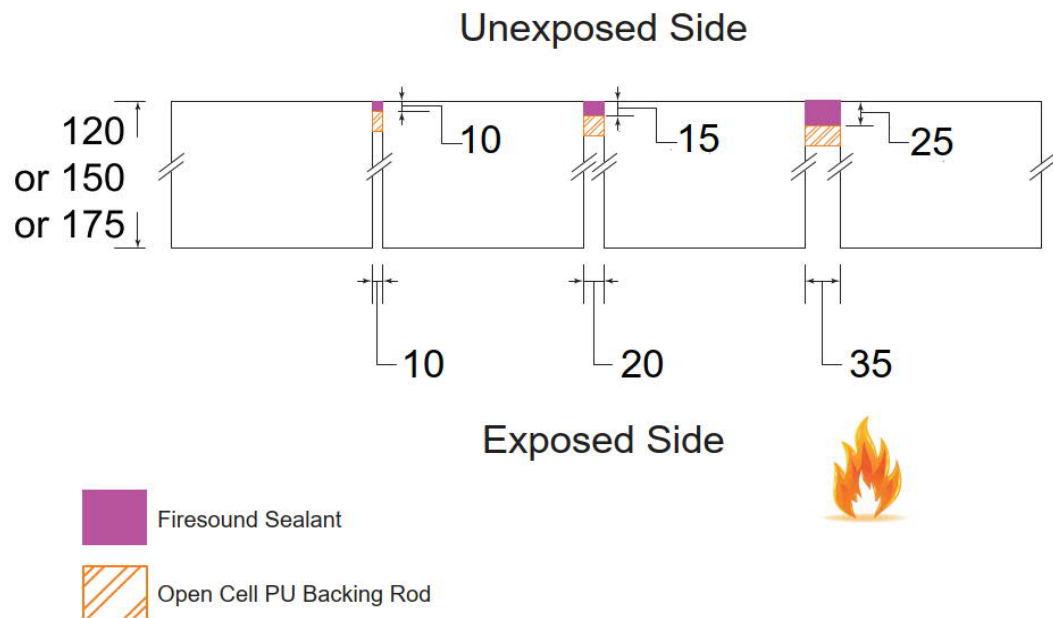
Control joints with HB Fuller Firesound sealant on non-fire side in concrete walls and floors
